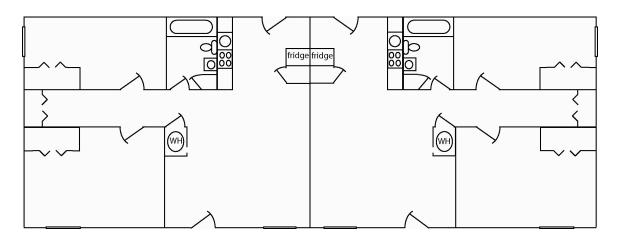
Floor plan of one-story duplex apartments (not to scale).
